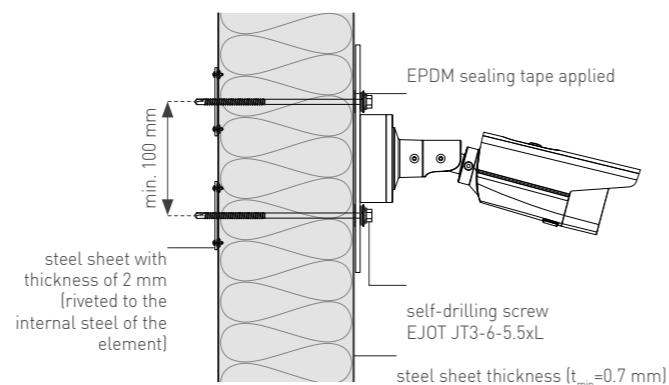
Fastening through the panel to a 2 mm steel sheet with screws.
